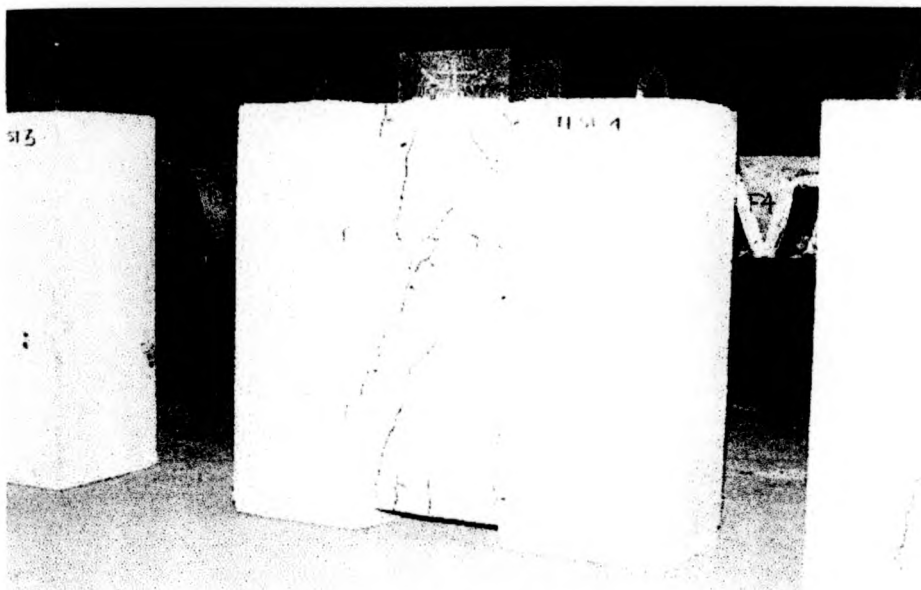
Concrete cracks pattern of PT4
